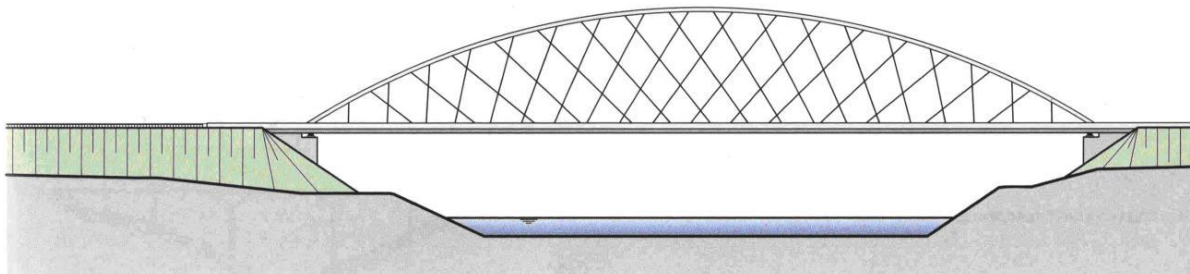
Network arch as Innovative alternative Railway Bridge [26]
